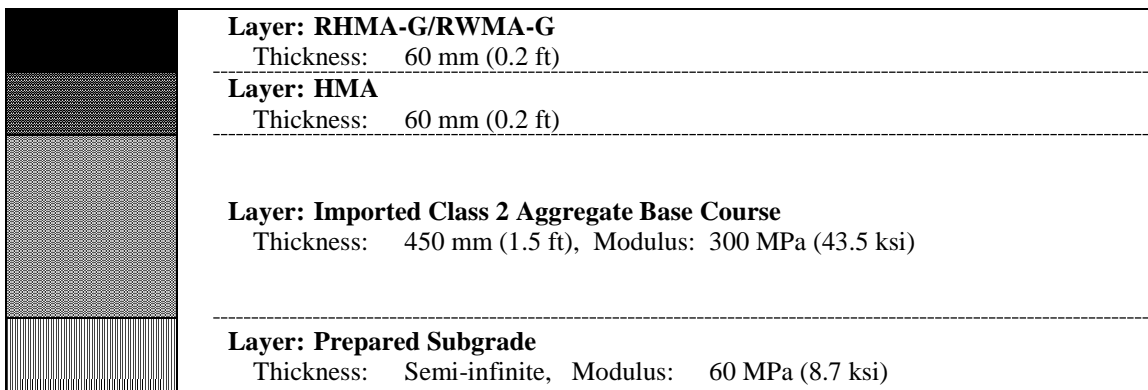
Original pavement structure for the rubberized warm-mix asphalt test sections.
